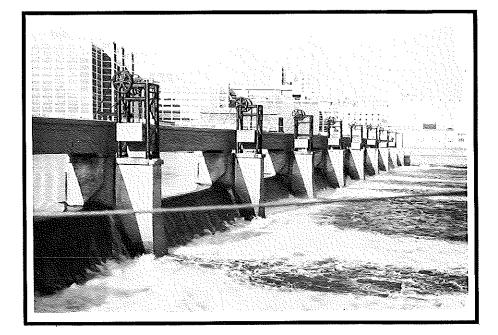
CEDAR RIVER BRIDGES AND DAMS Top view shows the 2nd Avenue bridge on the west side of the island at Mile 118.72, looking upstream. Bridge on the east side is similar.
